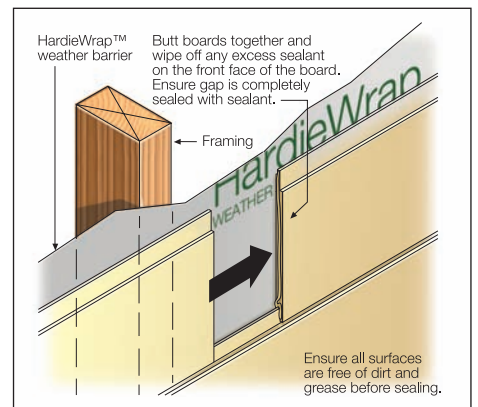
OFF STUD JOINTING ( STEP 2/2 )
